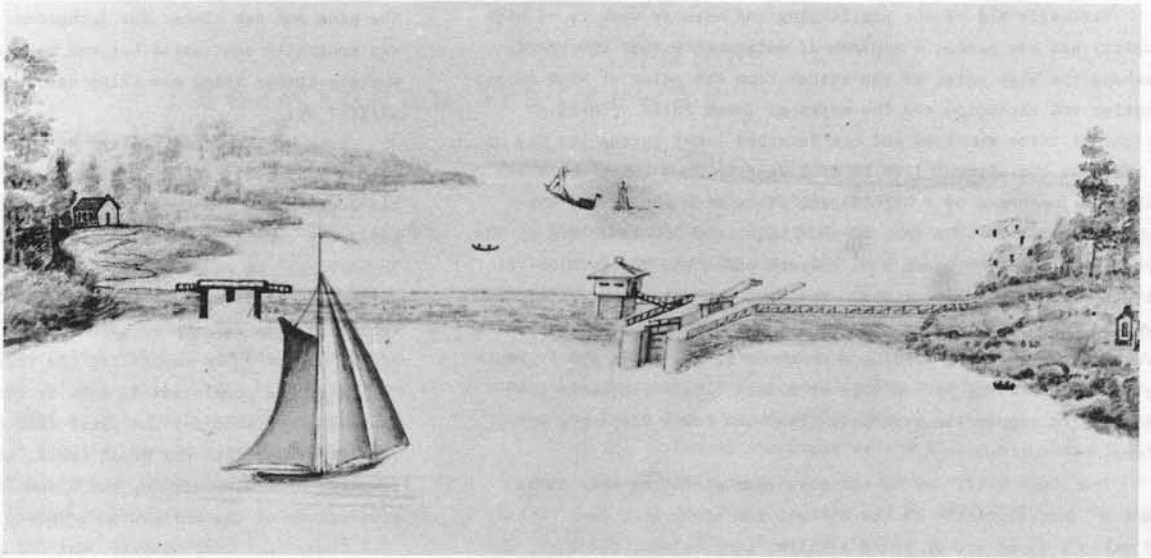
"Long Island. 1823 to 32. Station No 5- 14 3/4 miles from Bytown." A classic Rideau lock station with arch-key masonry dam swinging around to form one wall of the lock. Wash drawing by Clegg.
